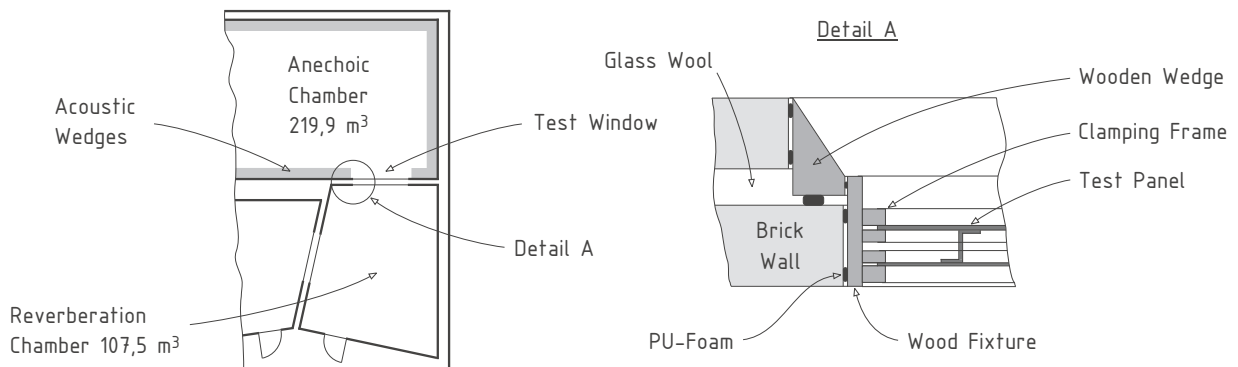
Schematic plan of the transmission loss test facility and detail of test structure installation
